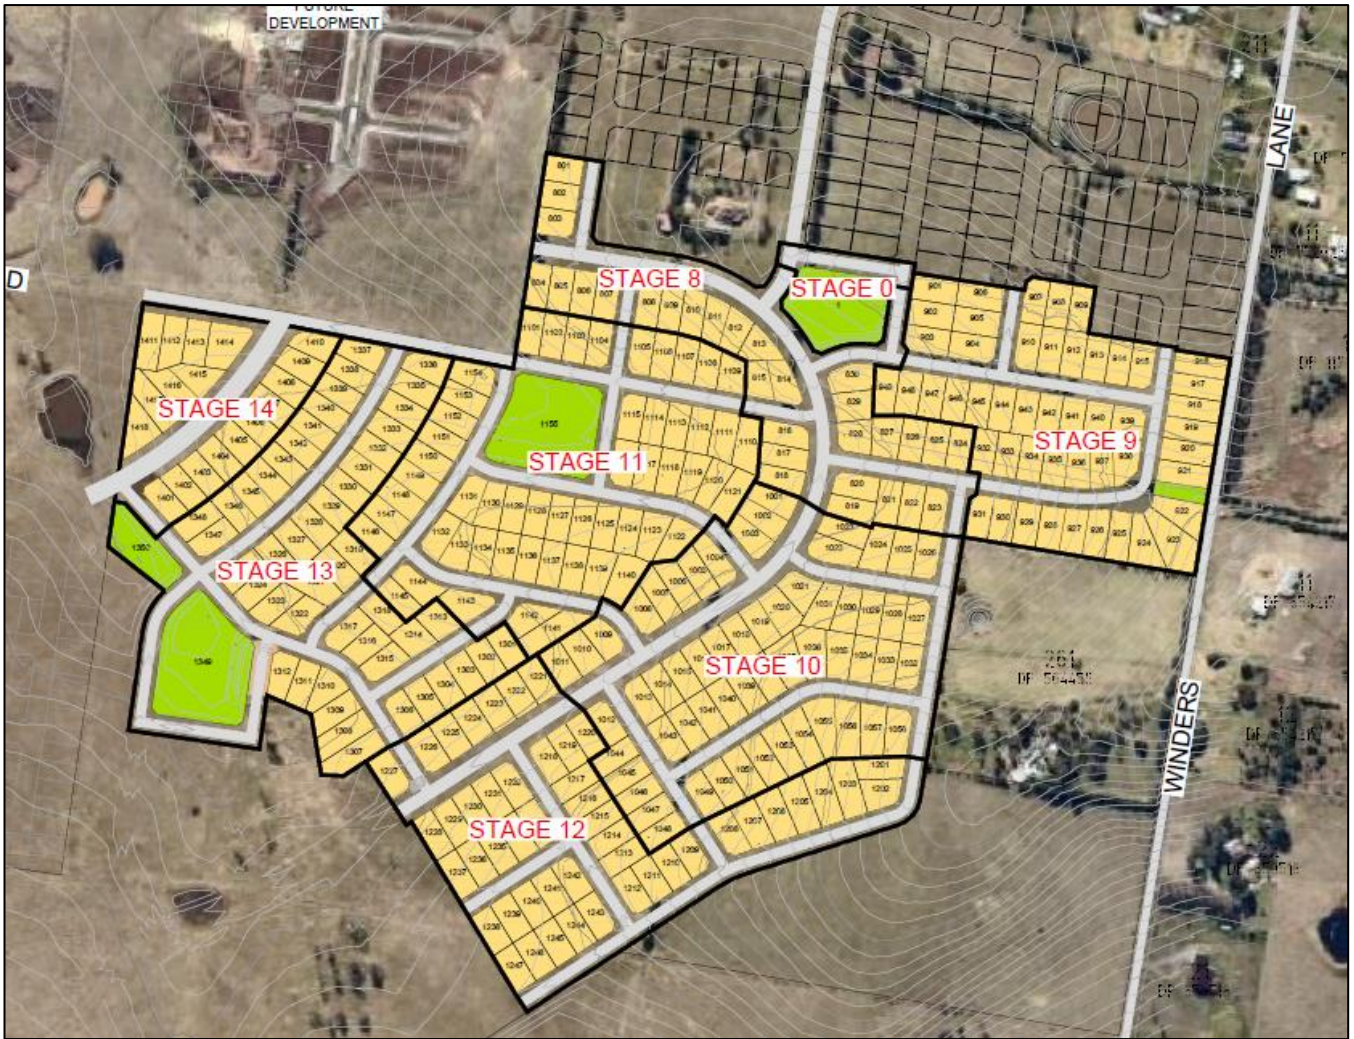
Extract from Overall Masterplan - Stages 8 to 14 (Source: BRS; 18.10.2021)
